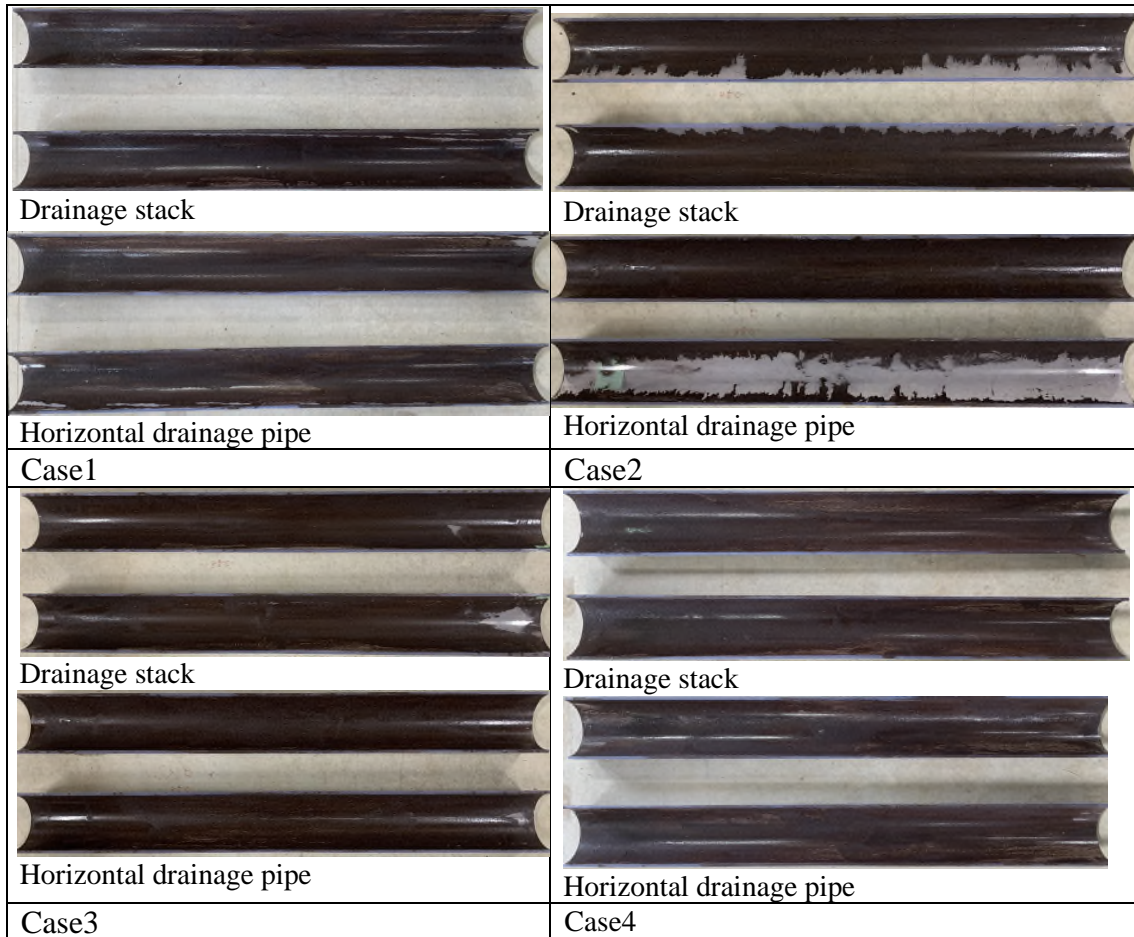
Removal situation after washing (Piping with pseudo-dirt)
